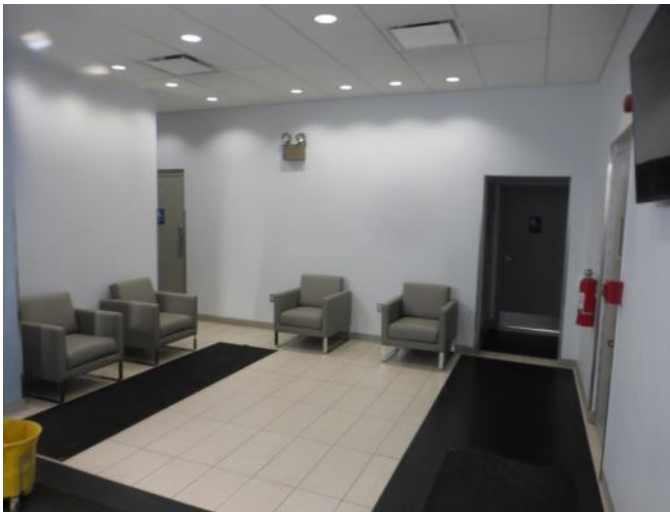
Facility Upgrades – New Lighting, Floor Tiles, and Paint
